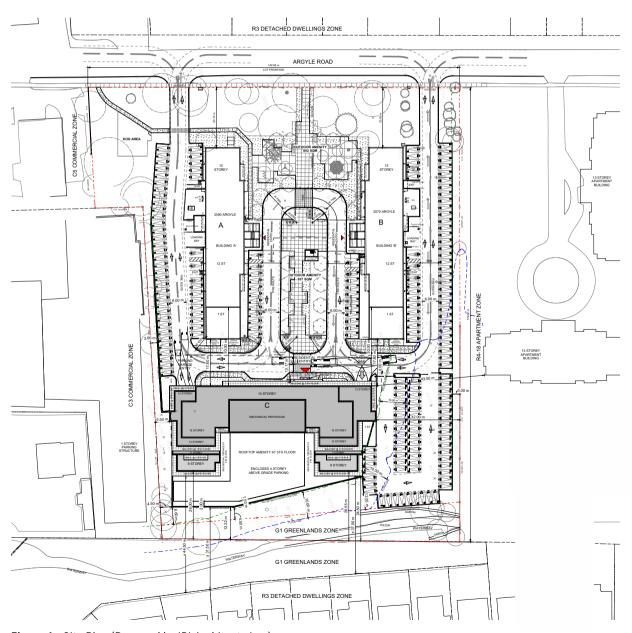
Site Plan (Prepared by IBI Architects Inc.)
